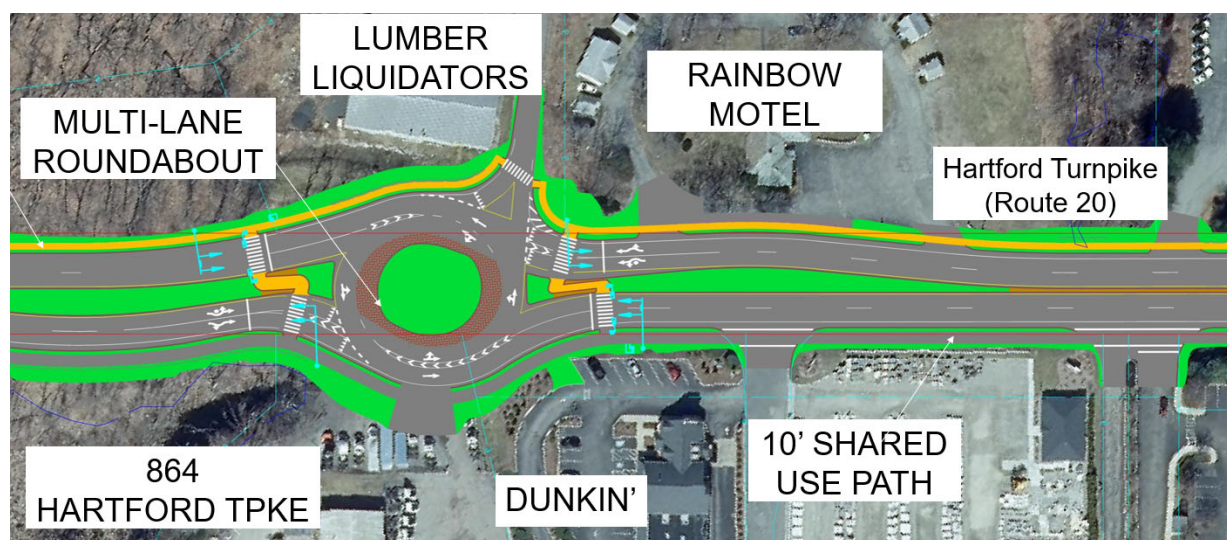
Project 25% design public hearing rendering: plan near Dunkin' Donuts driveway.
